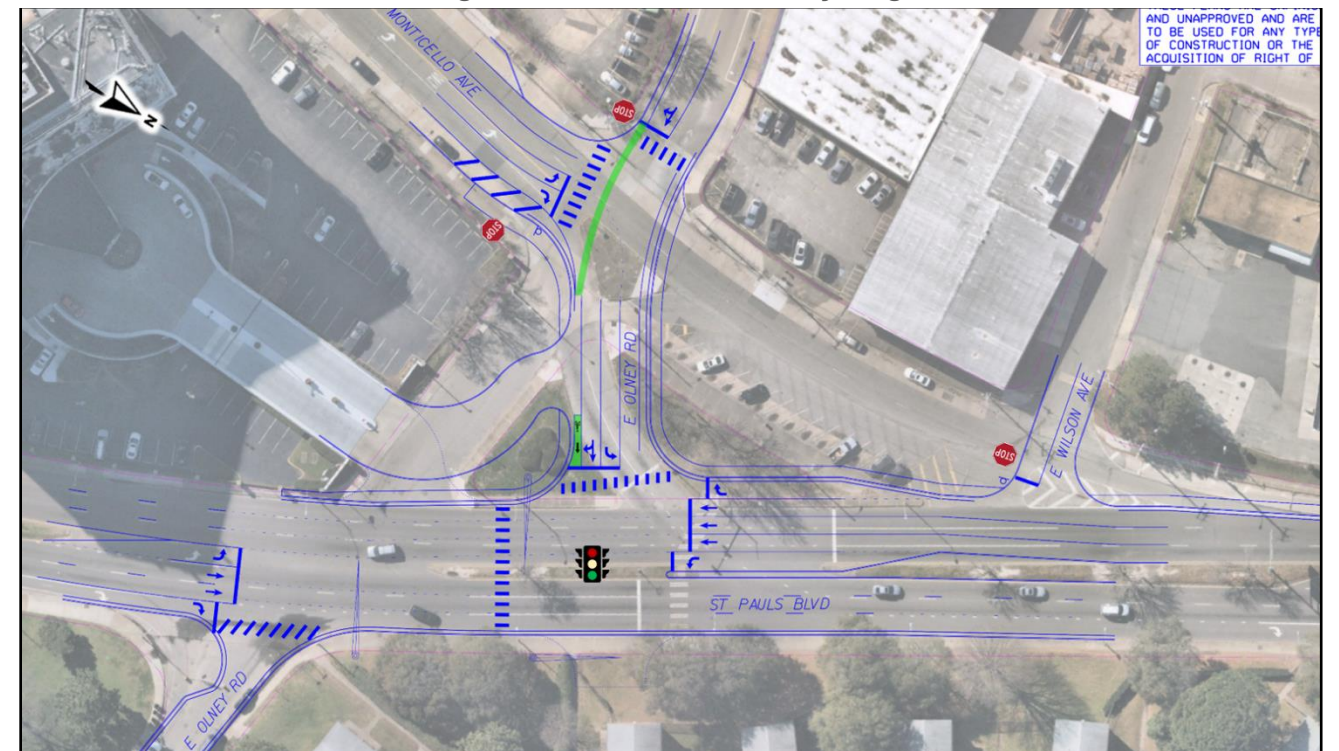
Phase 2 Concept – St. Paul's Boulevard & Monticello Avenue at Olney Road Reconfiguration – Existing Olney Alignment
